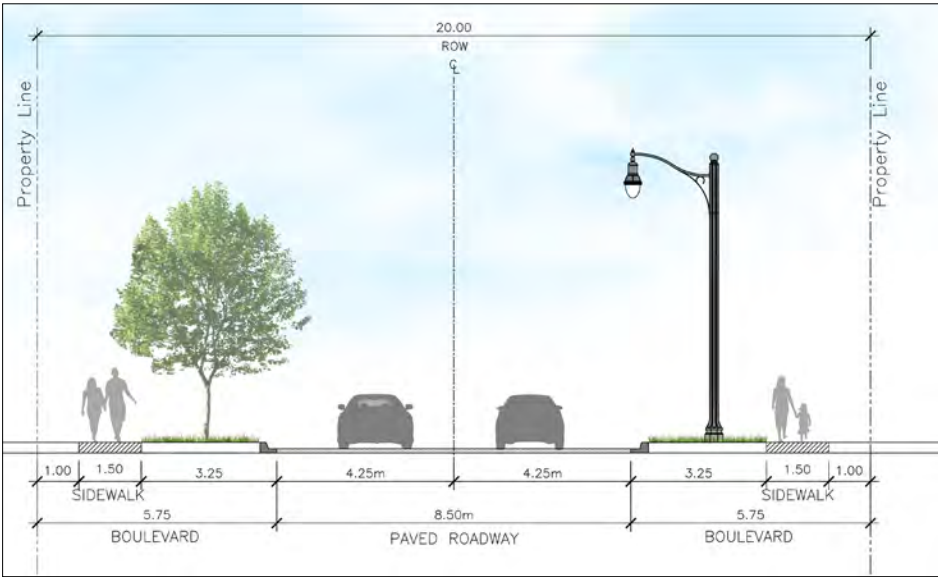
Local Roads 20.0m Right-Of-Way TYP. Cross Section
